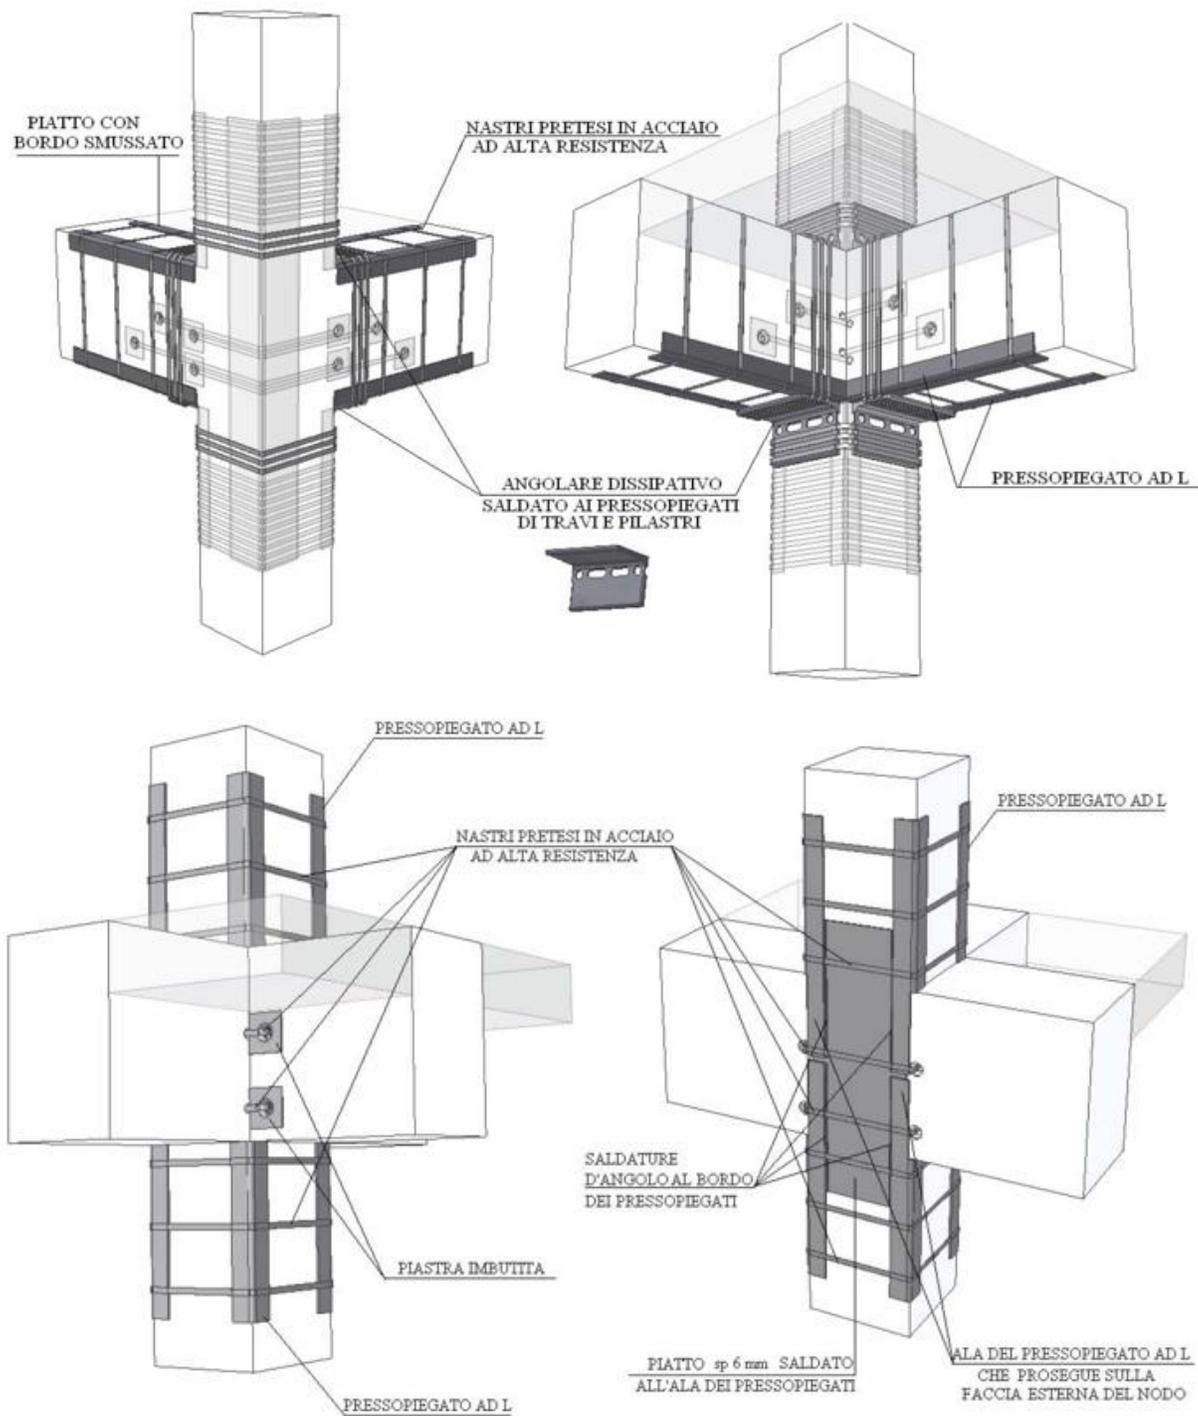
Reinforcement of the joint of the beams with steel strips and corner profiles and Reinforcement of the joint of the pillars with L-shaped press-bent profiles, plate and steel strips.
